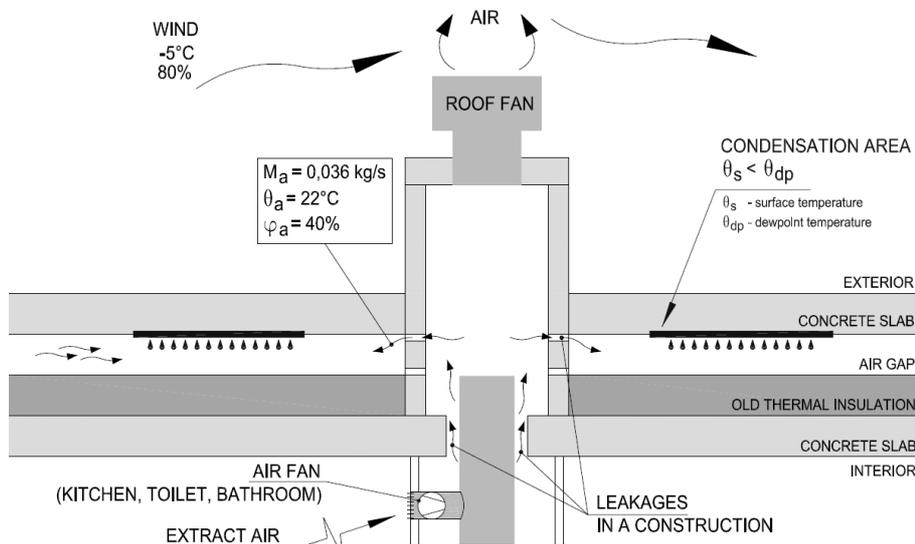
Sketch of double skin roof with vertical shaft and leakages in roof construction
